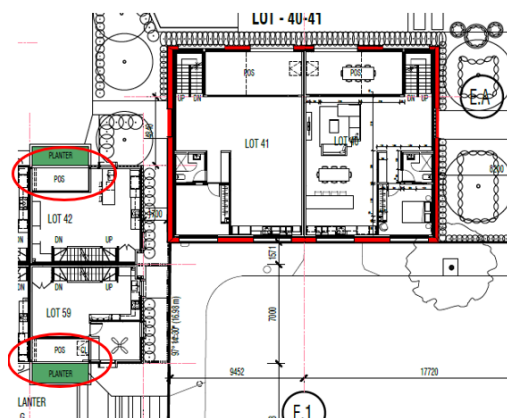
Approved First Floor Plan of Development – southern neighbouring SPOS circled red (endorsed plan for MPS/2015/269/A)
